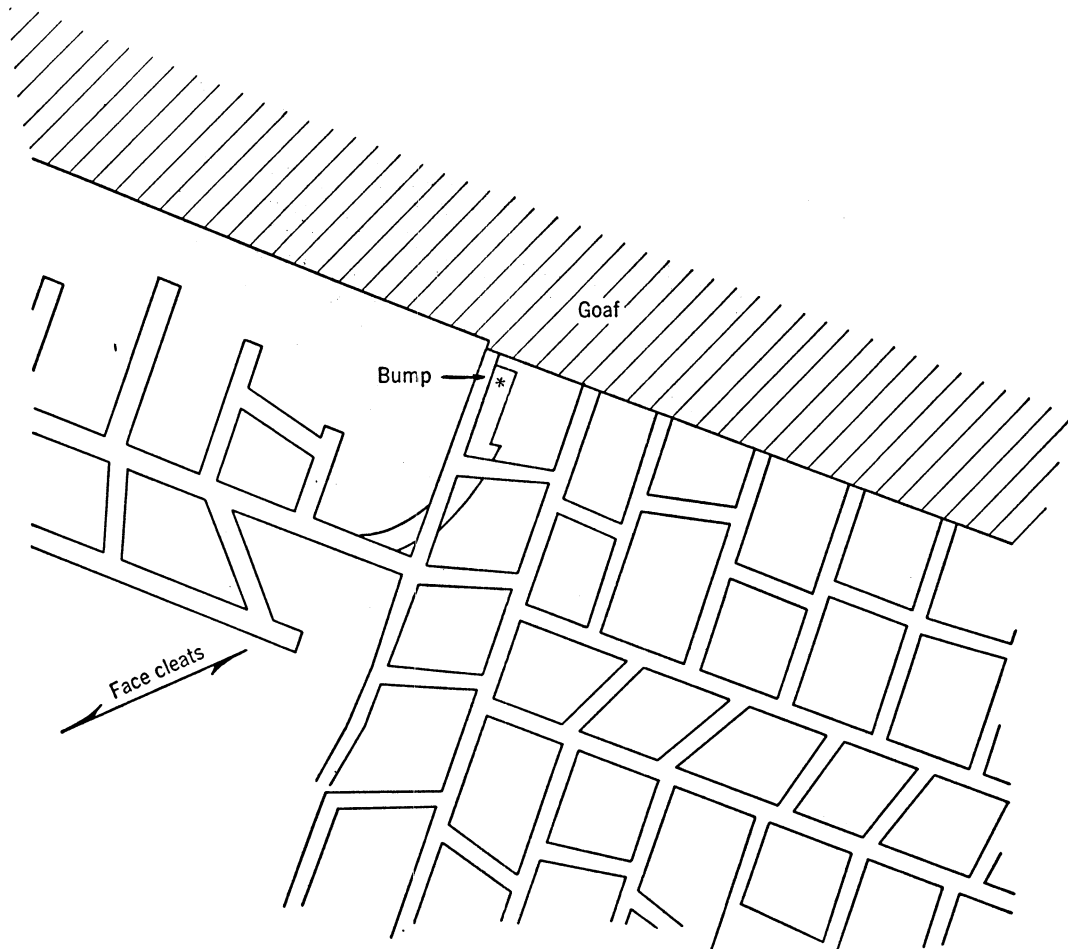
Bump on a Pillar Line in Which a Pillar Was Being Slabbed and the Slab Driven Through an Area of High Abutment Stress Toward the Extraction Line.
